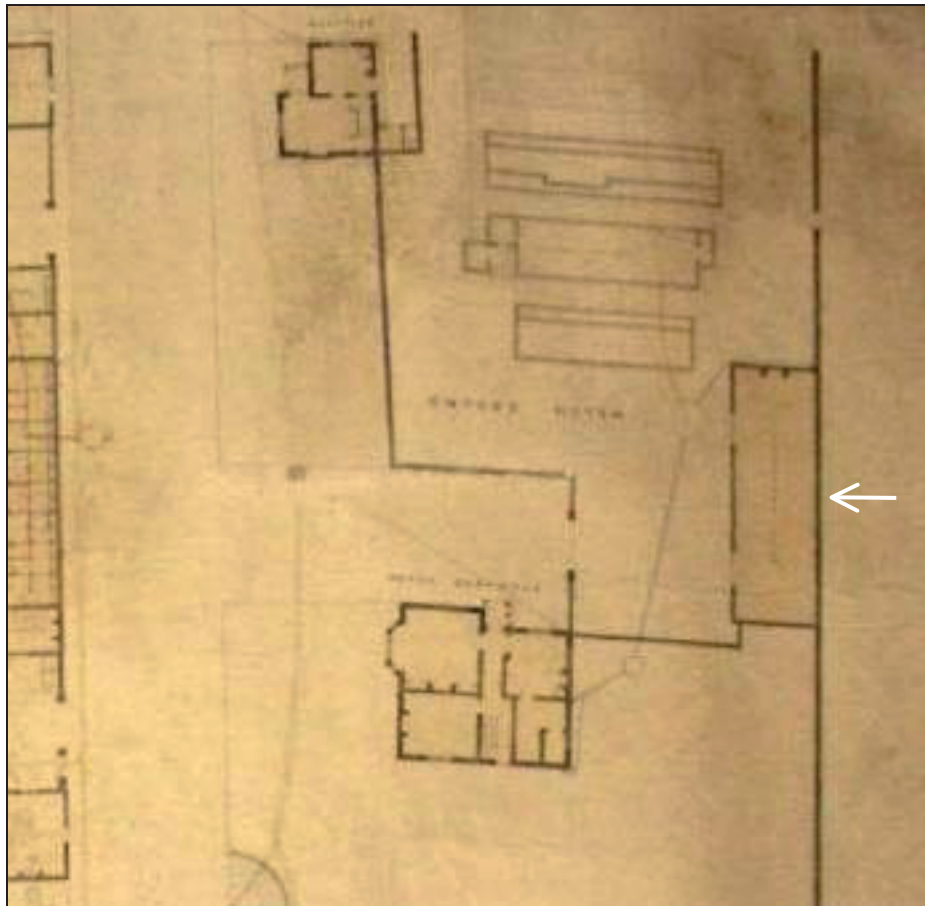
Extract from Cubitt plan, 1855, showing building as proposed
